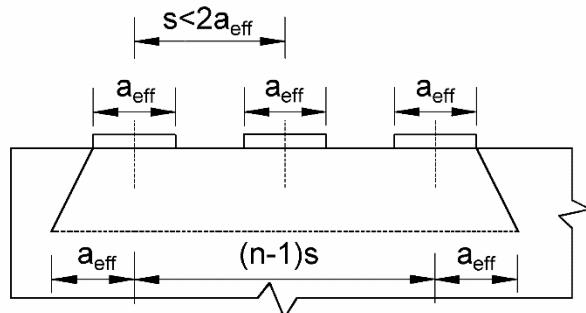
Closely Spaced Multiple Anchorages
